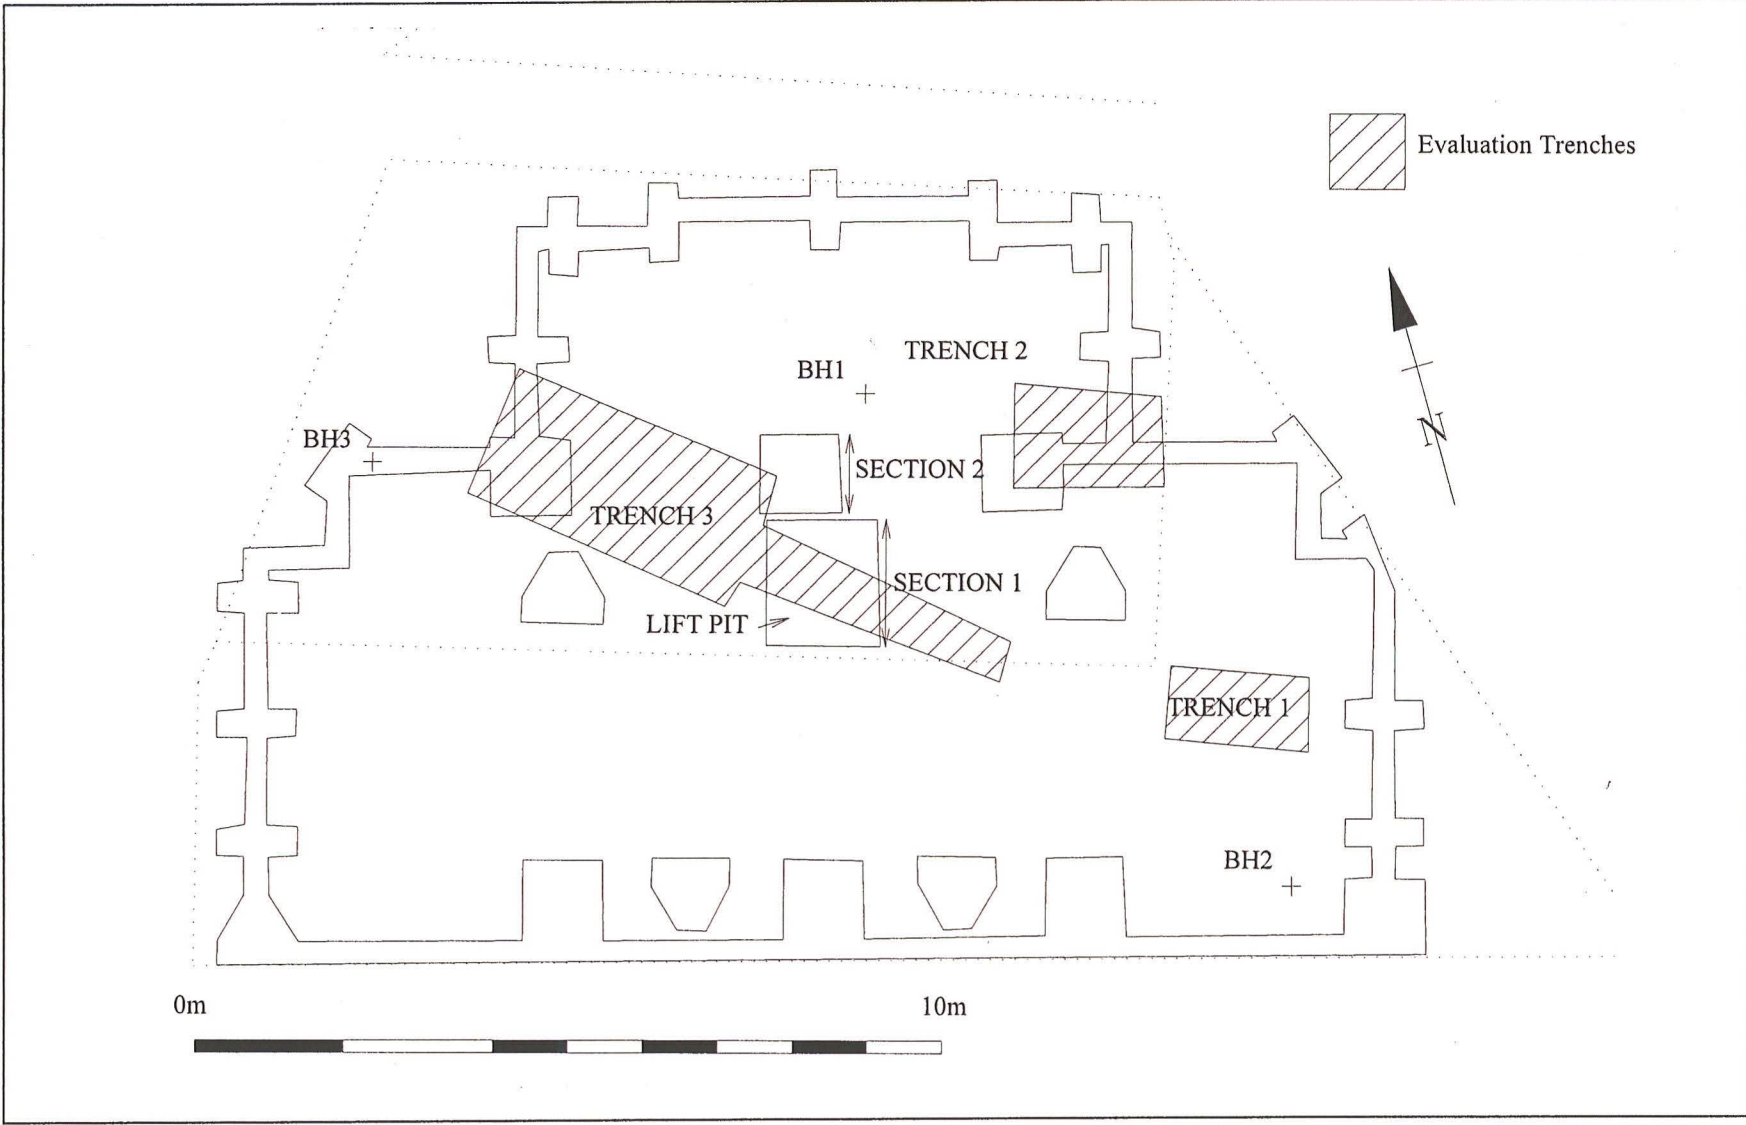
Section location plan, also showing position of Evaluation trenches and boreholes.
